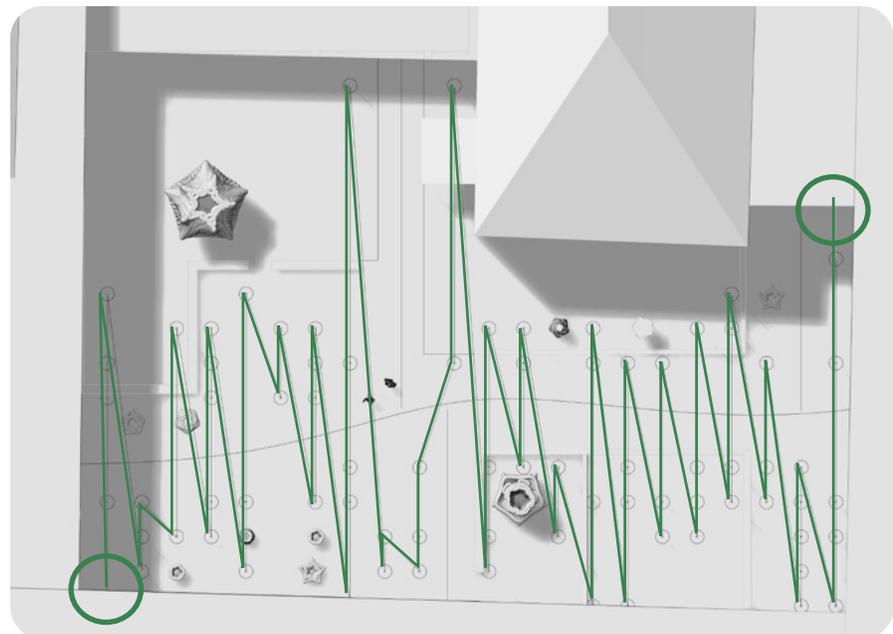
Pipe insertion into building at southwest and northeast locations.
